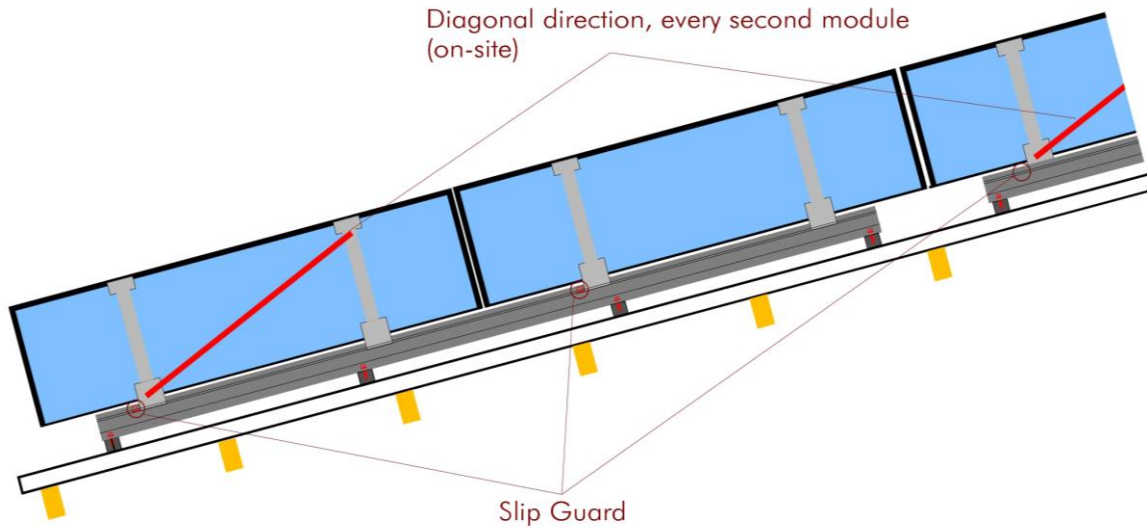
Diagonals for slip protection on highly-sloped roofs and high downward forces
